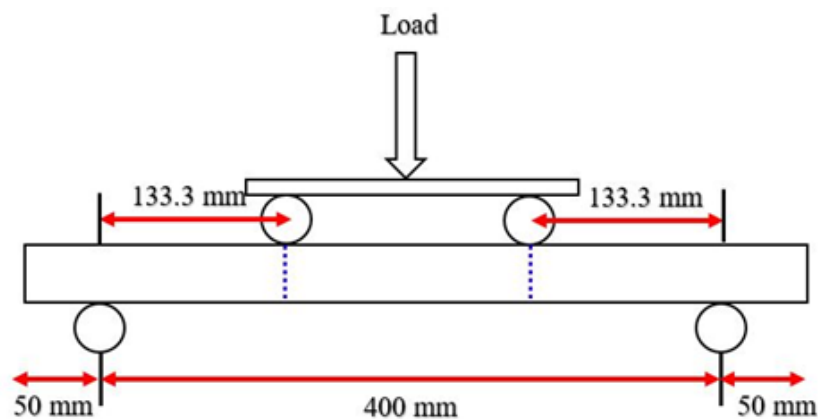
Marking and position of specimen for testing flexural strength of concrete
